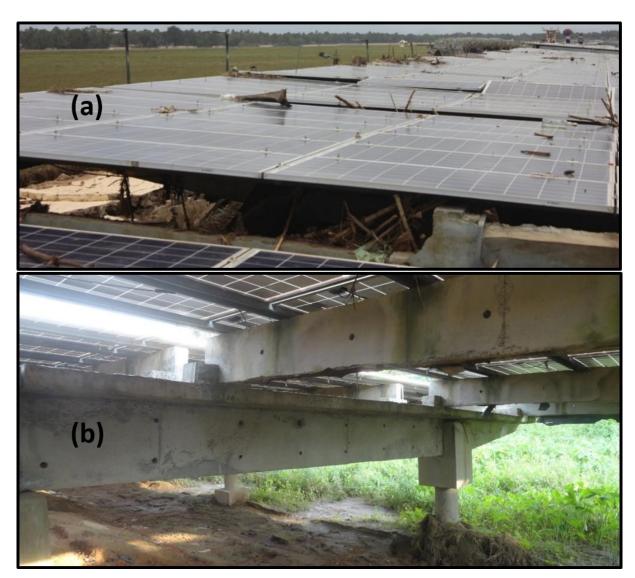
(a) Top view of Canal top plant P2 showing that hardly any damage to modules or structures was seen despite this plant being submerged under fast-flowing water. (b) Bottom view of the all-concrete structure of P2 showing concrete beams.
